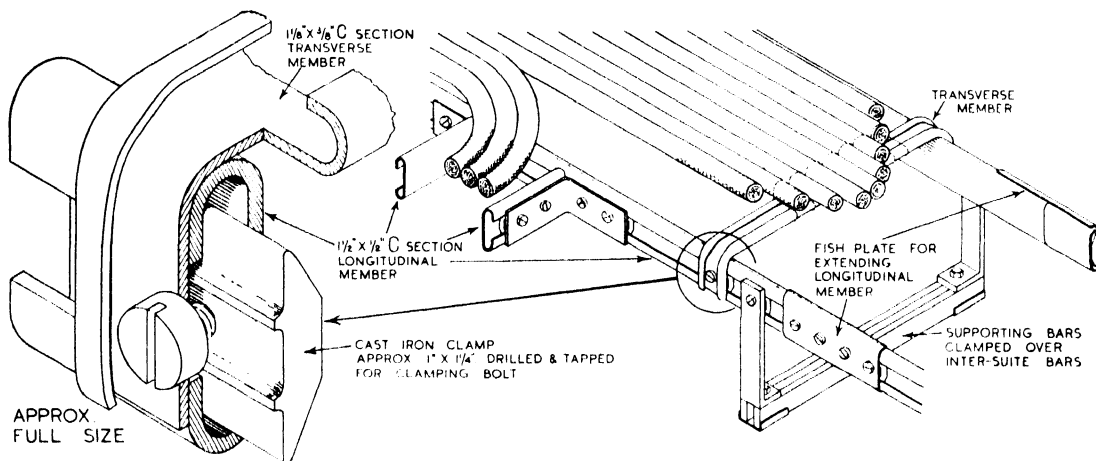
CONSTRUCTION OF UNIT TYPE CABLE RACKING
